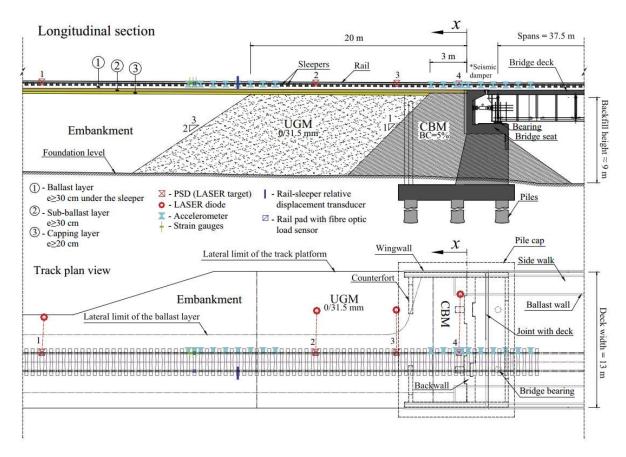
Schematic longitudinal profile and plan view of the transition zone [4]
